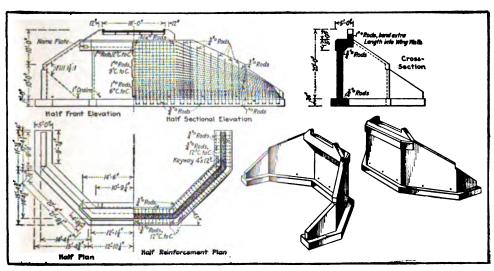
Reinforced Concrete Highway Bridge Abutments.
